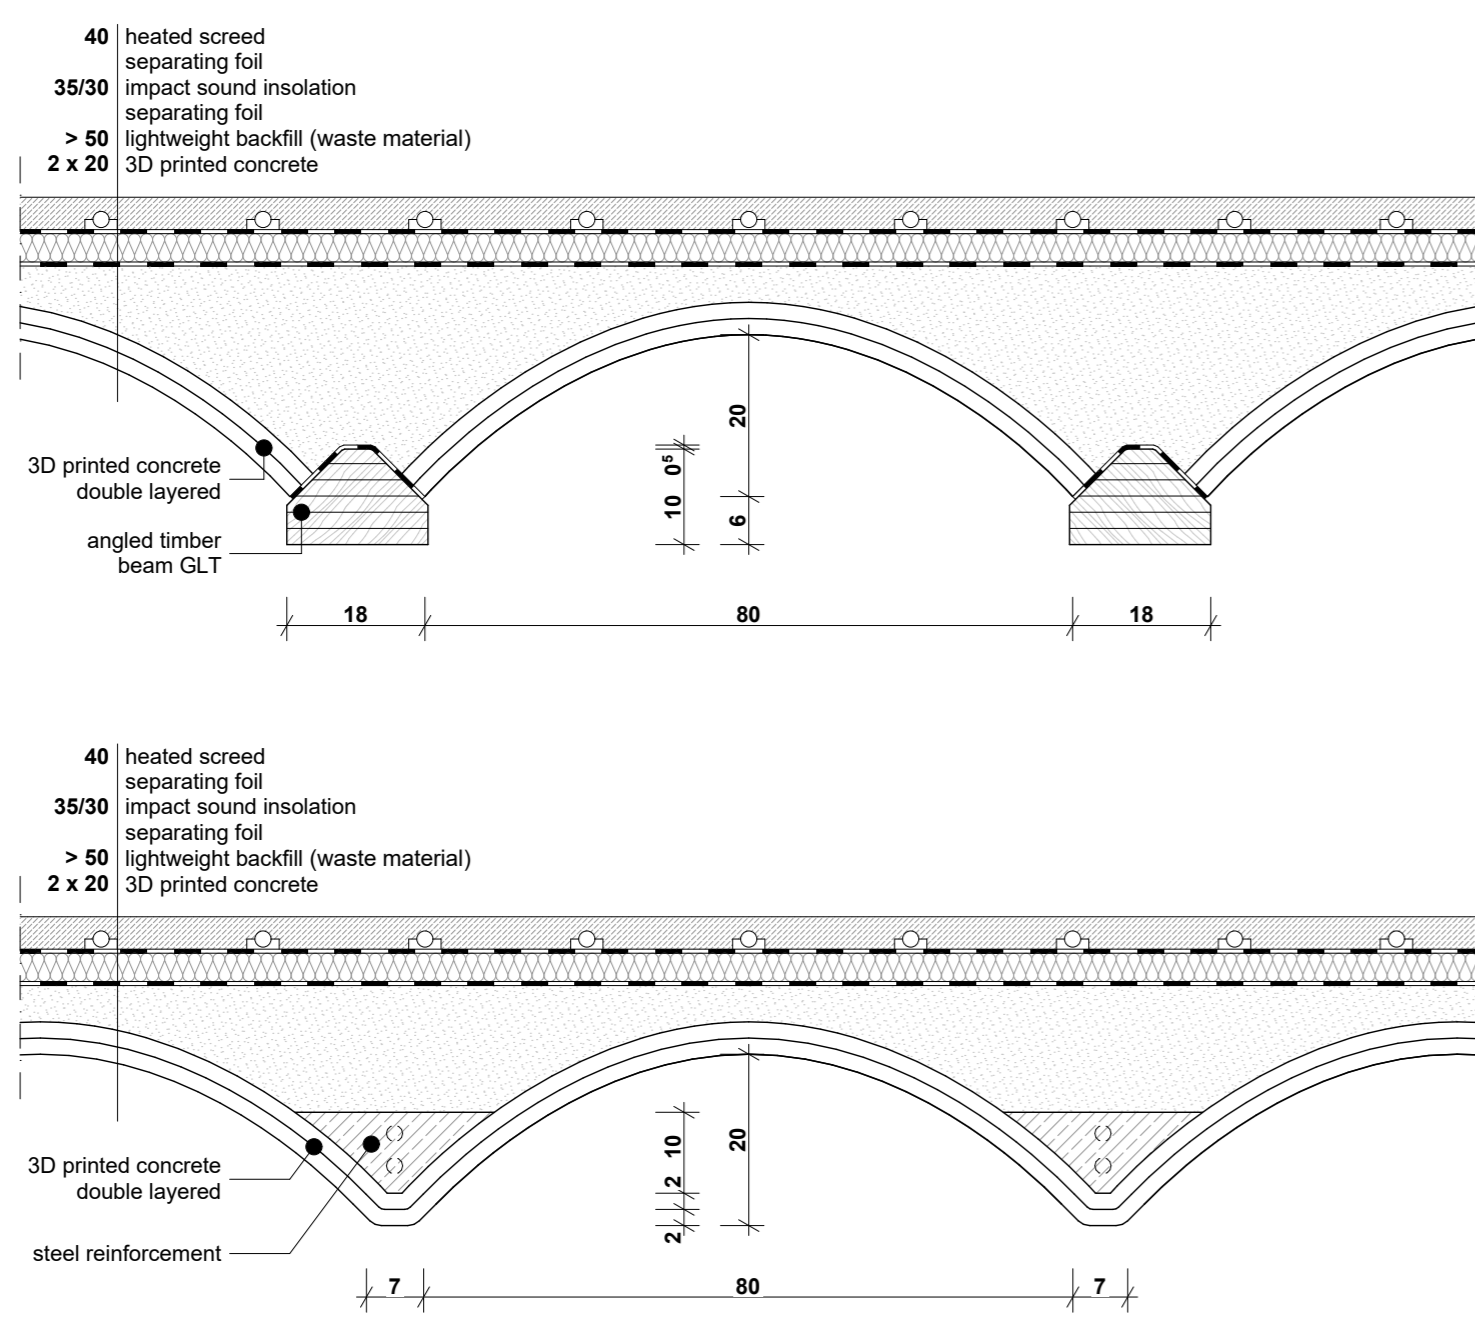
Construction details of the Kappendecke 2.0 - Top: Trapezoidal GLT beams
